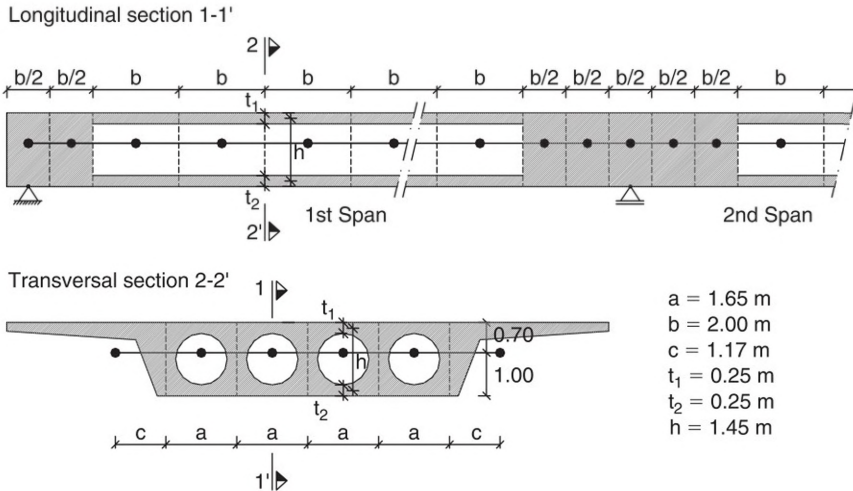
Longitudinal and transversal sections of the deck, with the location of the beam elements used in the discretisation.
